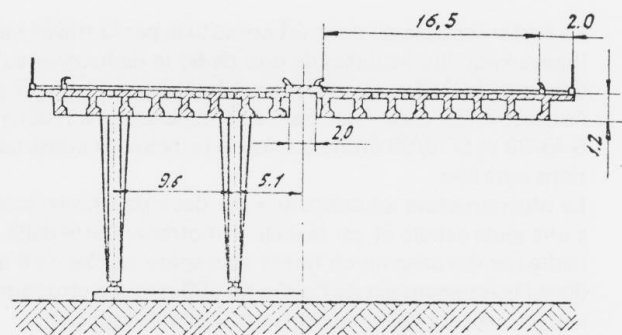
Cross-section of the prestressed concrete part of the flyover
